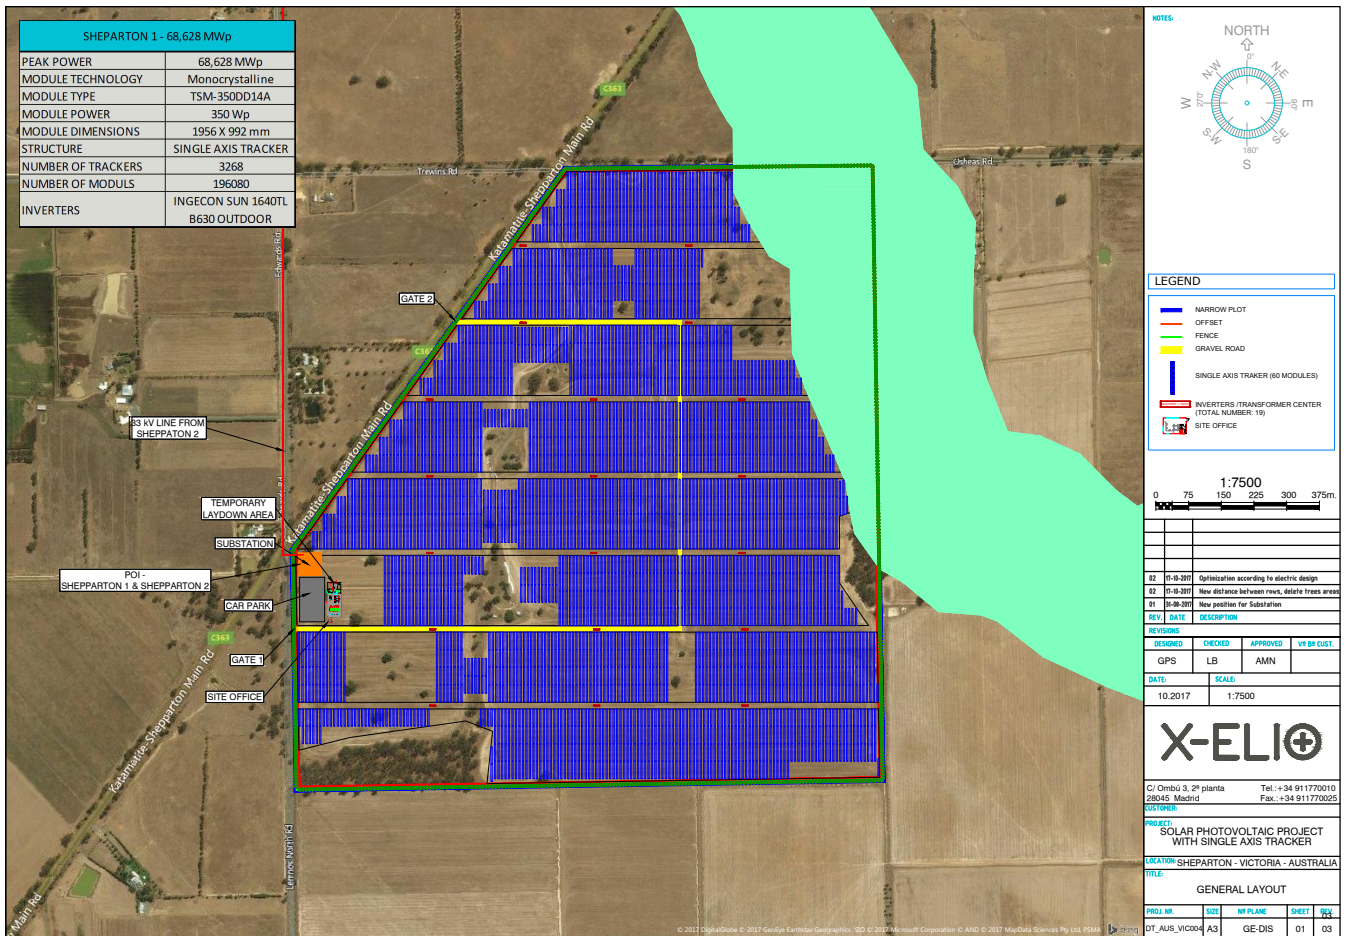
Project proponent map indicating proposed layout: 1090 Lemnos Road, Congupna
